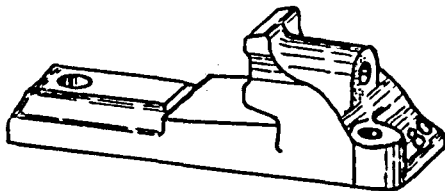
TYPICAL 60, 80 & 100 LB. COMMON TOE CHAIR X LAYOUT
